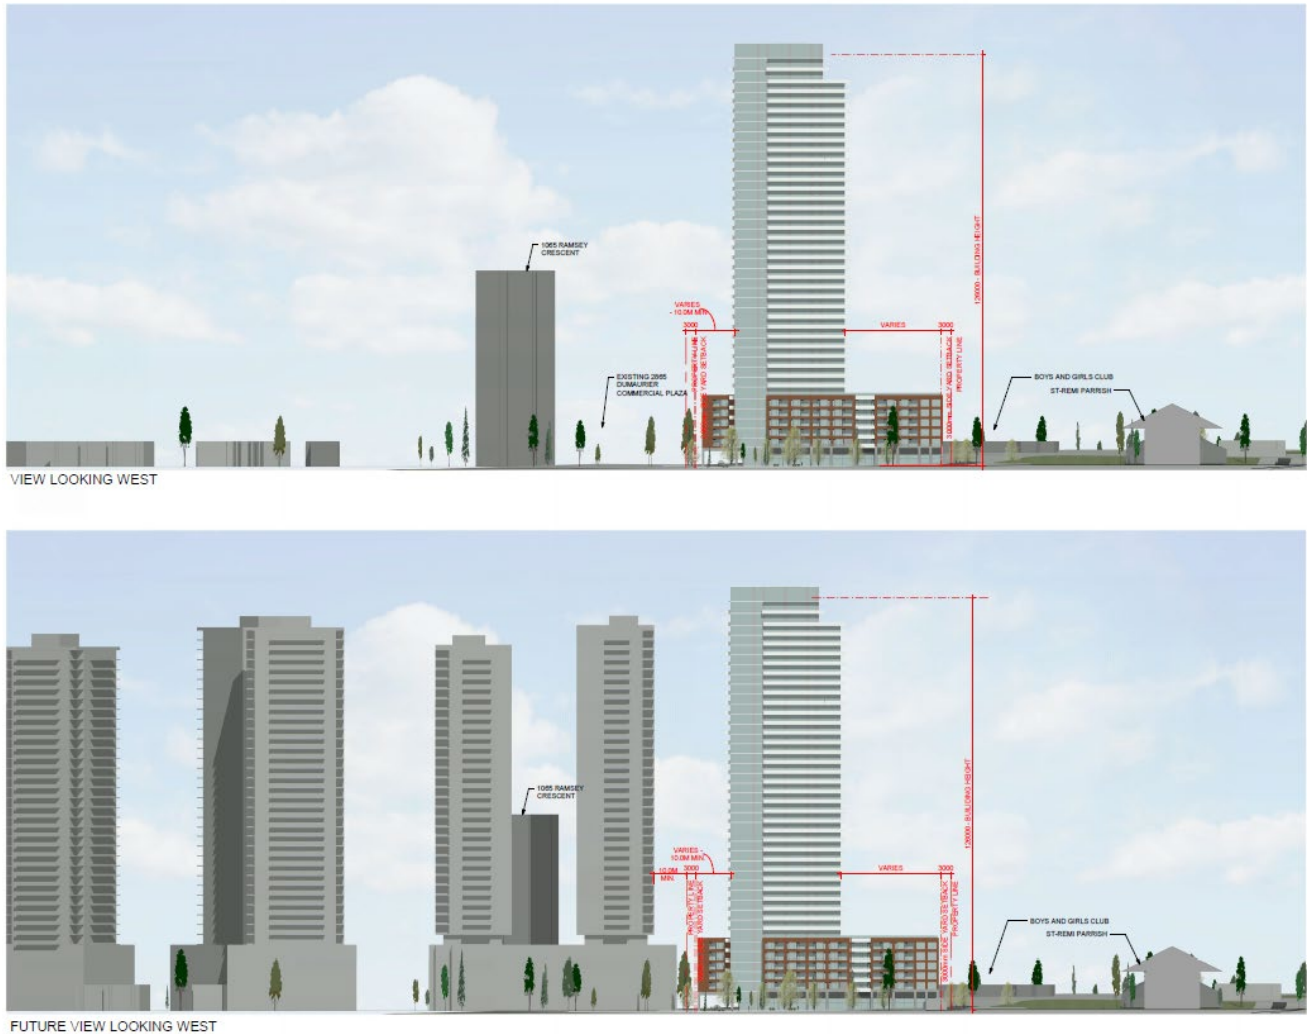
Views Looking West of the Existing and Future Context of the Subject Property and Surrounding Area
